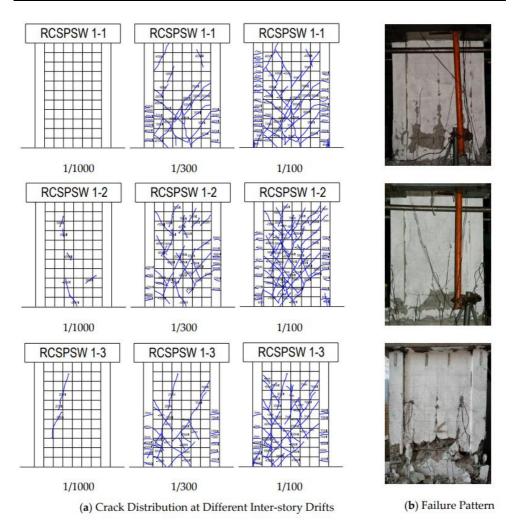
Crack patterns and failure mode of CESP walls that failed in shear (Ziang
